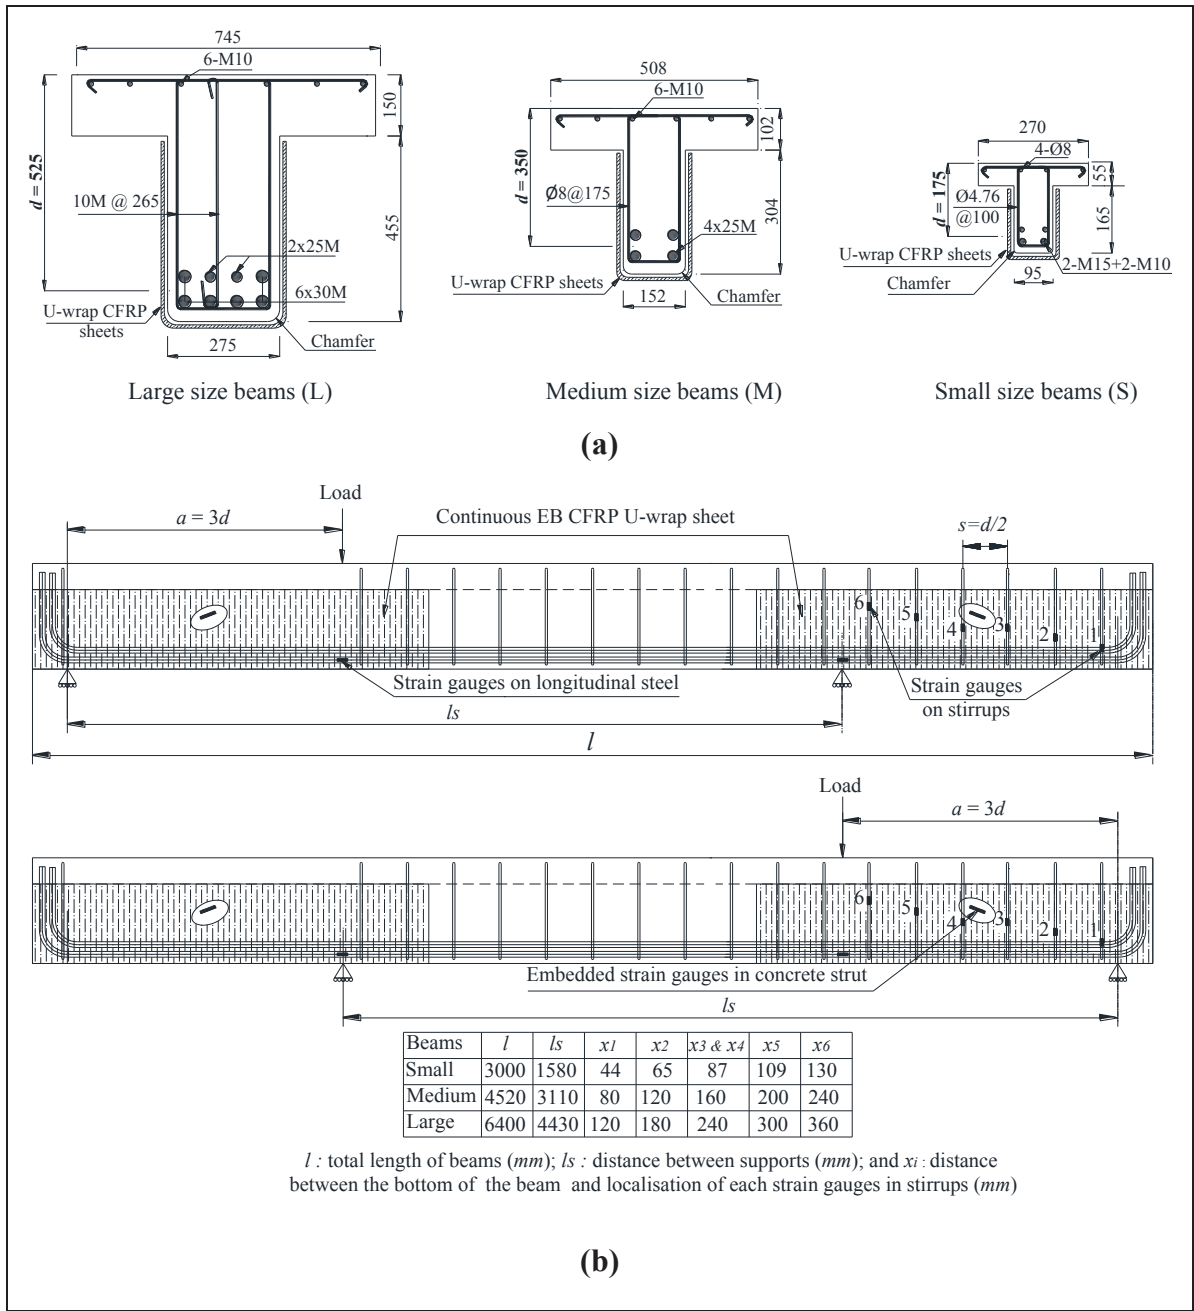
Details of beams: (a) cross sections of geometrically similar T-beams (mm); and (b) typical elevation, and internal instrumentation
